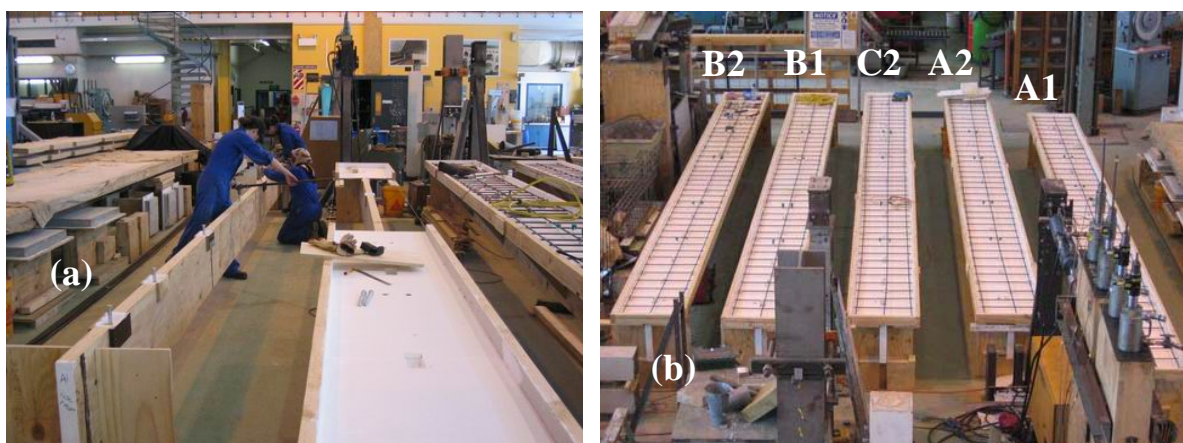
(a) Constructing formwork for the flange; (b) Beams A1, A2, B1, B2 and C2 ready for concreting in the laboratory
